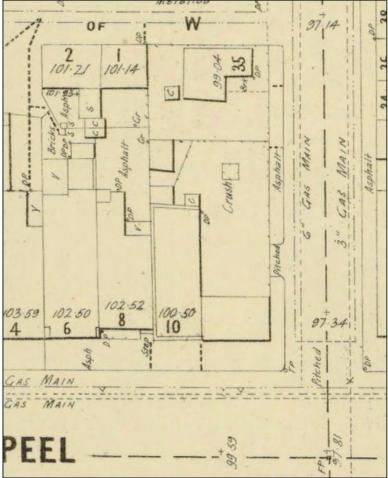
This MMBW detail plan #1201 shows three Victorian buildings occupying the subject site at 6-10 Peel Street in 1899.
